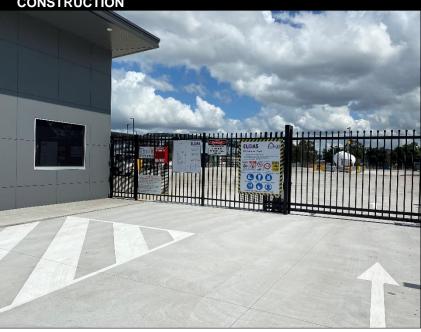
THREE MONTHS INTO CONSTRUCTION
